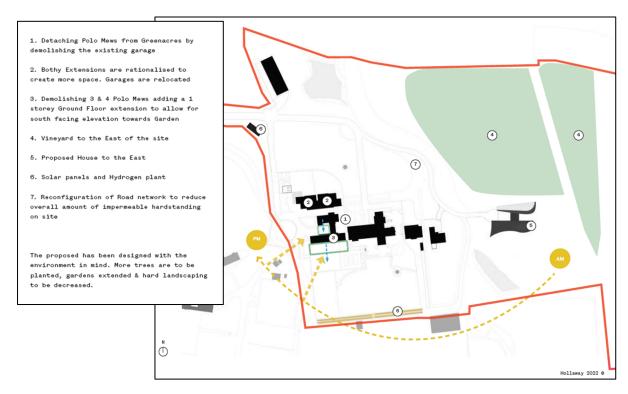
Concept masterplan detailing the extent of proposed development at the site, extracted from the Design and Access Statement.
